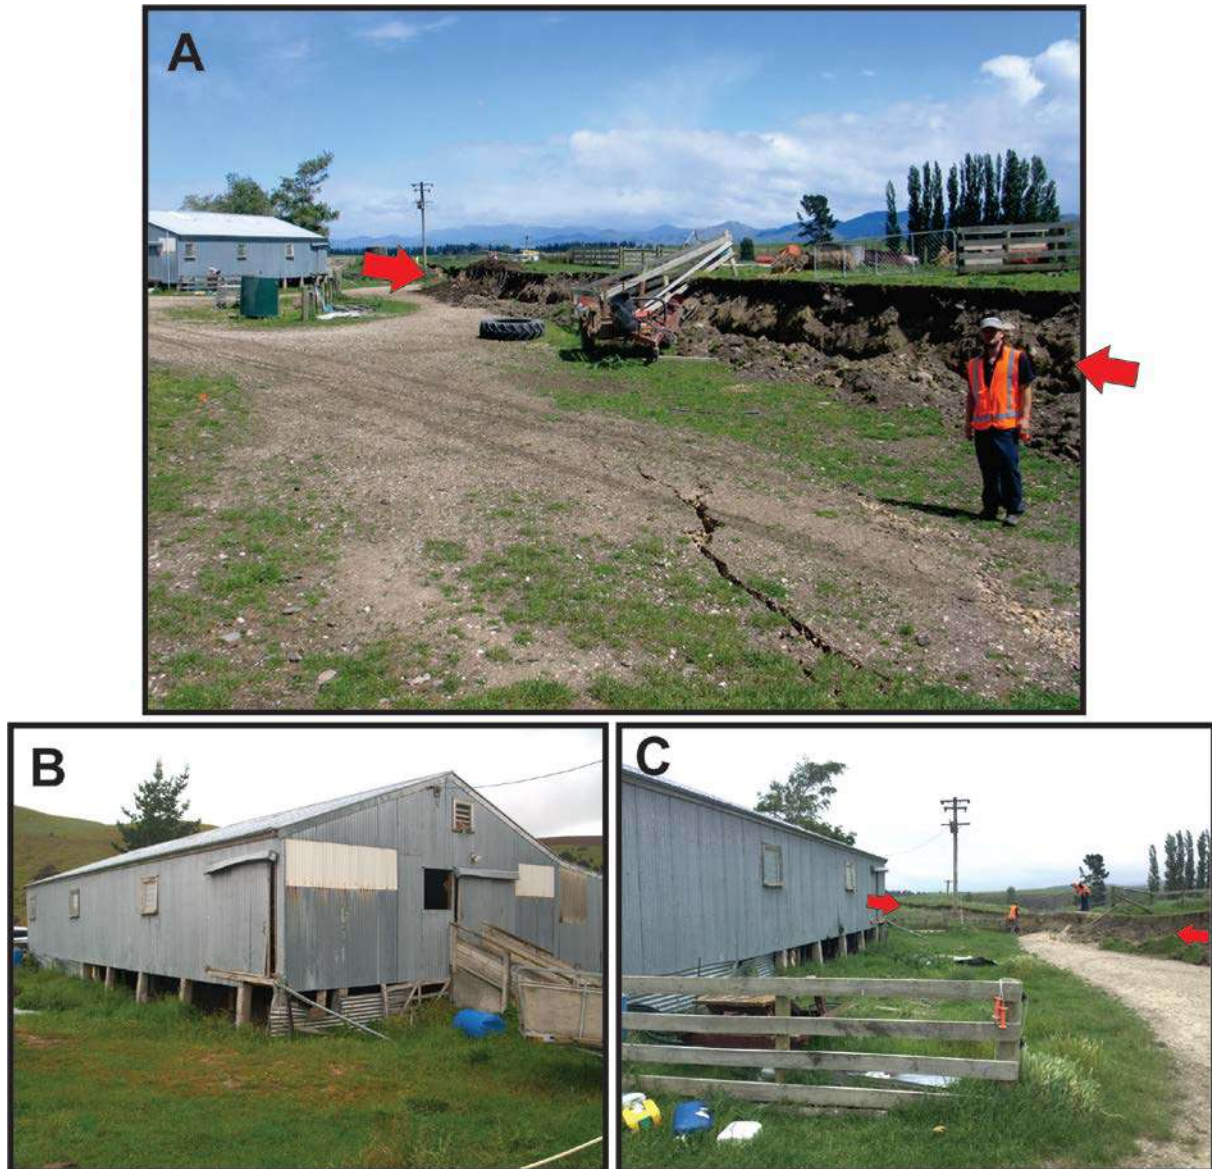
Glenbourne Woolshed and The Humps Fault surface rupture; see Figures A2.14 and A2.27 for location (Lat: -42.6152, Long: 173.1058). (A) View looking southwest along the fault rupture towards the woolshed. Note distributed centimetre-scale cracking in the foreground (in front of the high-vis geologist), adjacent to the main trace (red arrow, and behind the high-vis geologist). The distributed centimetre-scale cracking persists along-strike for many tens of metres. Photo by Jarg Pettinga, taken in November 2016. (B) View looking south at the woolshed (main fault scarp is behind the camera). Tilt and rotation of the shallow-seated concrete piles is the only recognisable damage. Photo by Clark Fenton, taken in December 2016. (C) View looking southwest along the side of the woolshed and towards the main fault scarp at this site. Photo by Tim Stahl, taken in November 2016.
